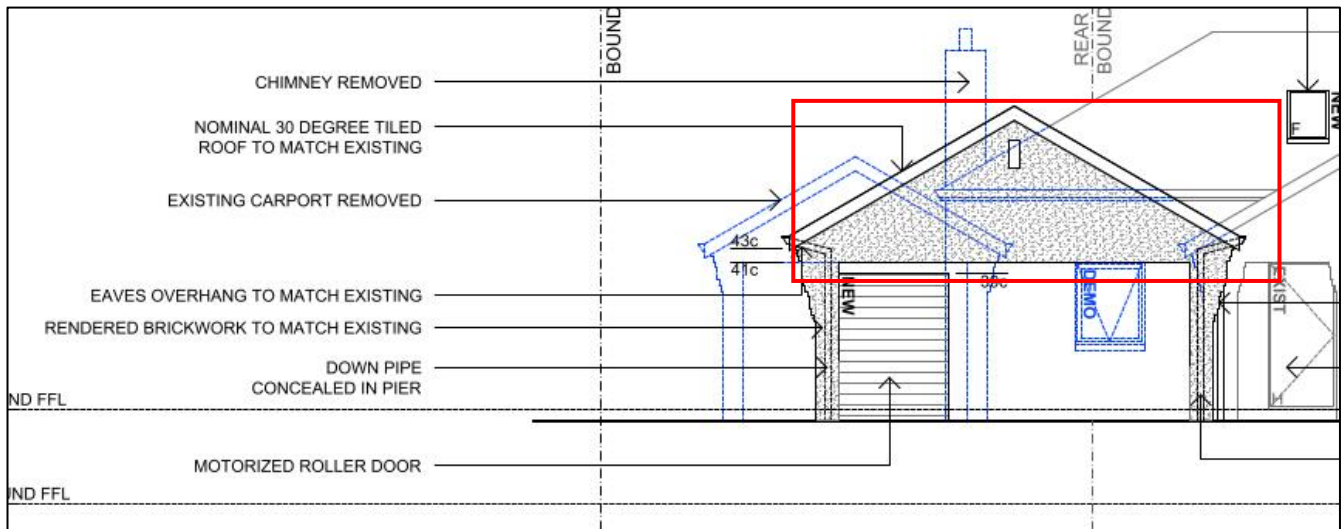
Proposed Wooden Gable Roof (East Elevation)
